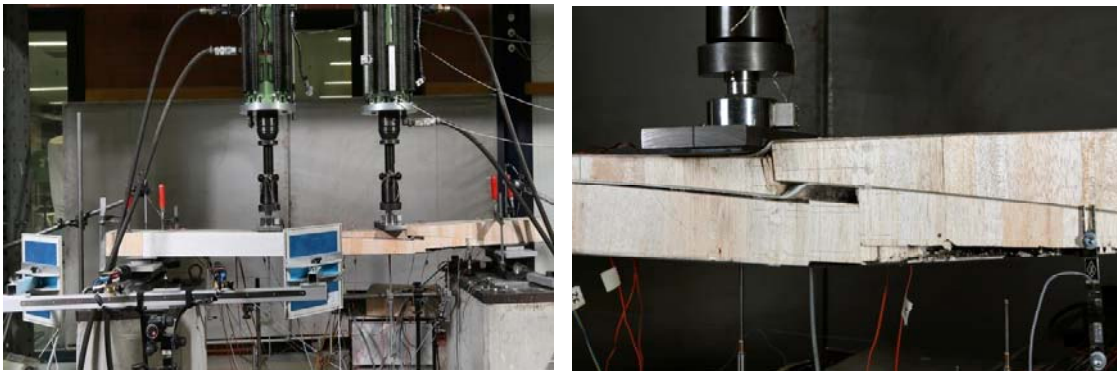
Failure of beam A-G-2 (left), zoom of detailed failure mode (right)
